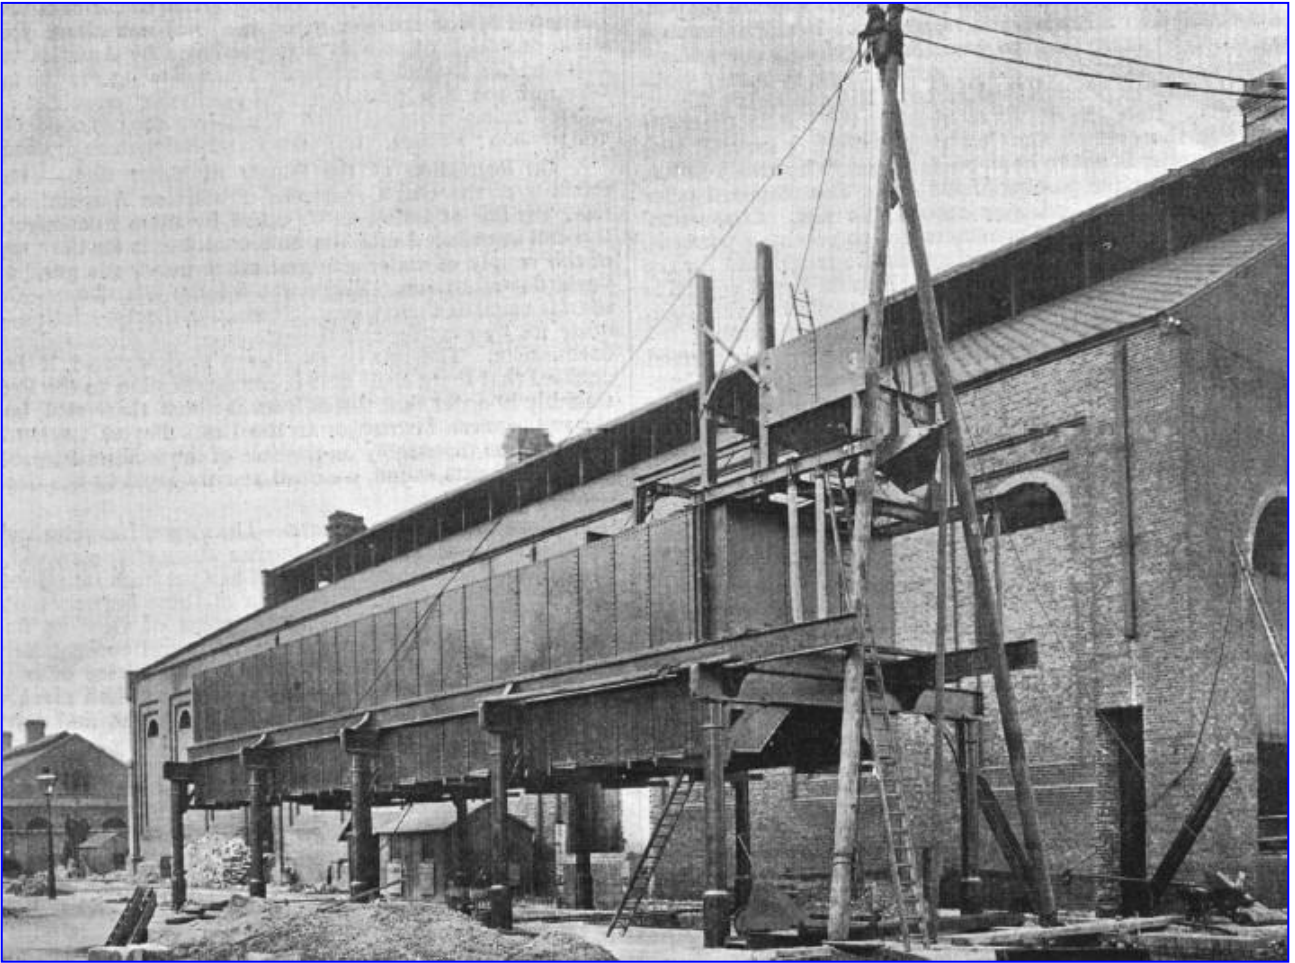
Archive photograph showing the coke hoppers and railway dock under construction, 1902, after The Journal of Gas Lighting and Water Supply 1902, 932 (NGA Ref: G7_1902_V80_P932)
